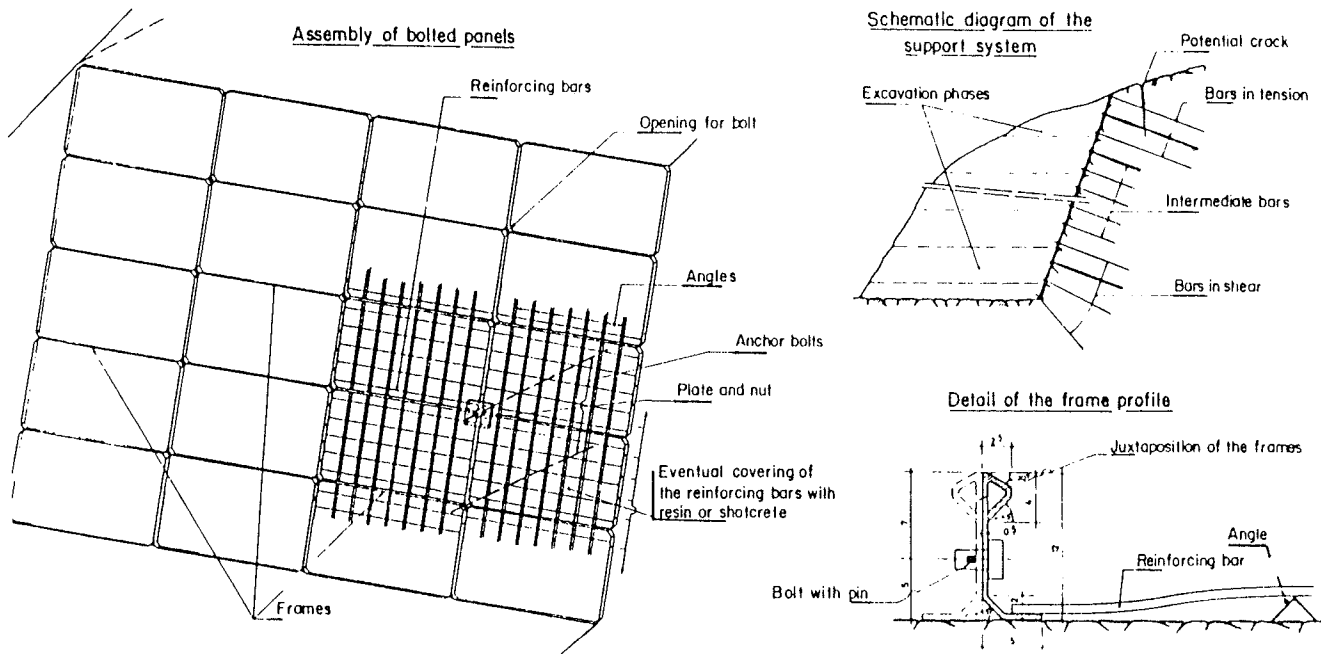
Facing with prefabricated metallic panels. [Louis, 1981]
